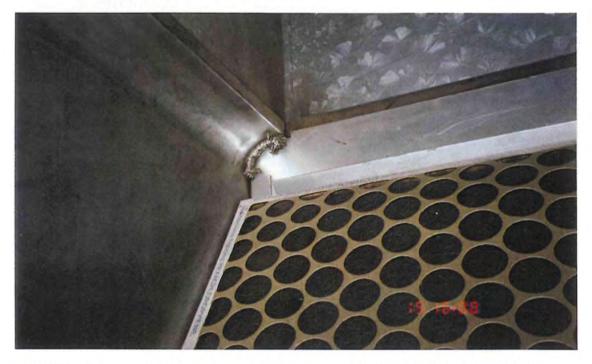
Asbestos-containing gasket in return air plenum of furnace in Building 2.
